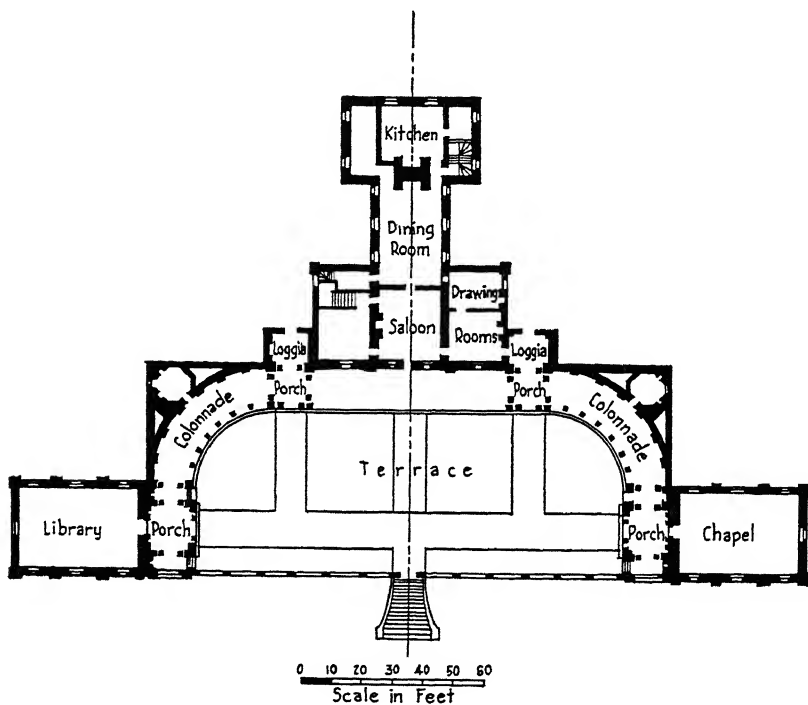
PLAN, STOKE PARK, NORTHAMPTONSHIRE (1630-1636)
